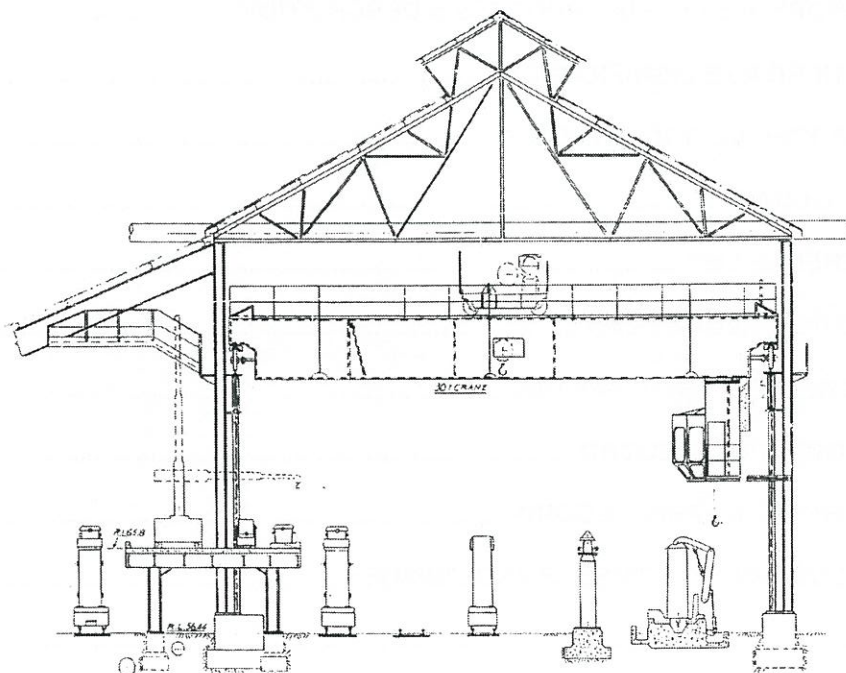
Section A-A, from "Layout of Equipment" drawing
